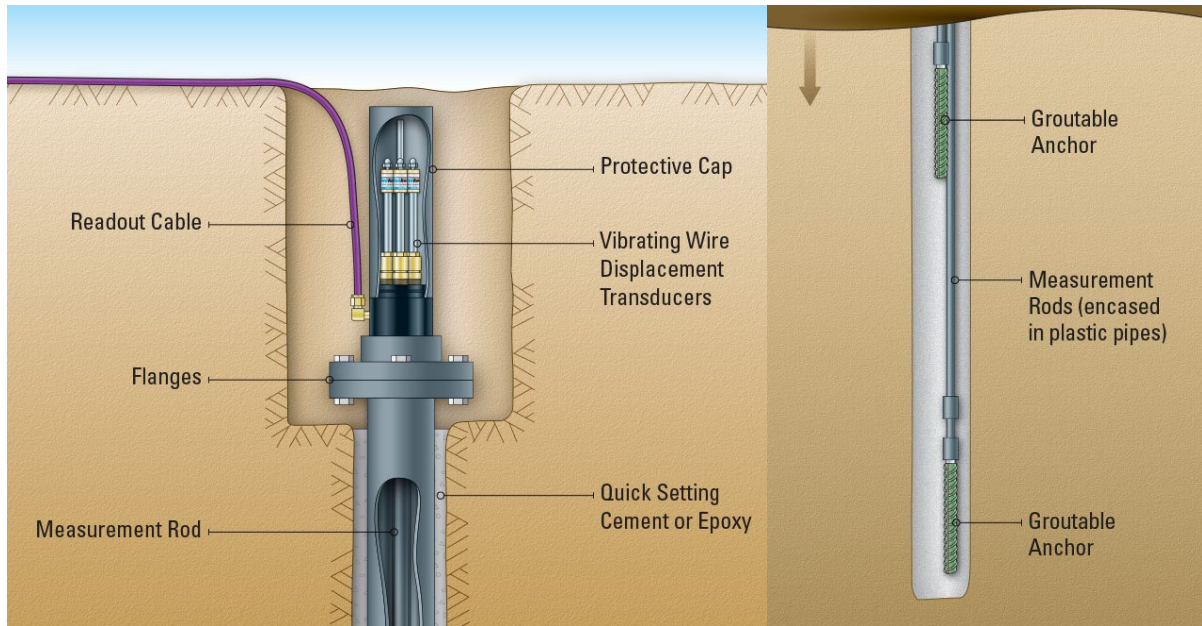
Geokon 4450 extensometer head assembly (left) and Geokon multiple point rod extensometer installed in sandy soils (right). (Geokon 2021b)
